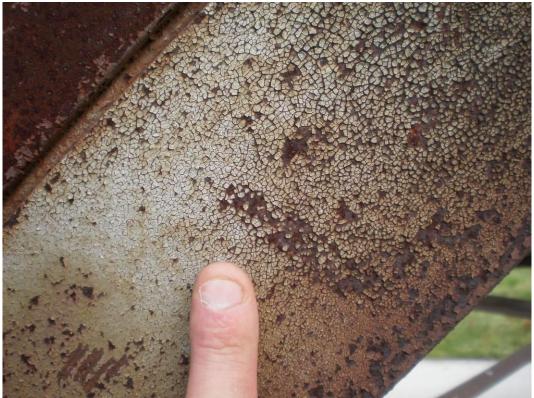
Coating Failure and Rust on the Outside Face of the Exterior Stringers
